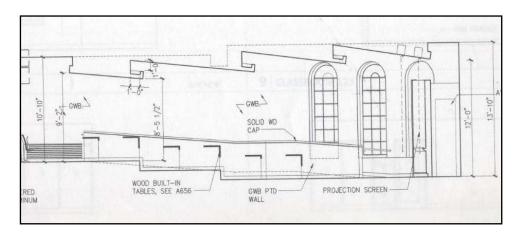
Section of Lecture Hall – Original Cove Ceiling
